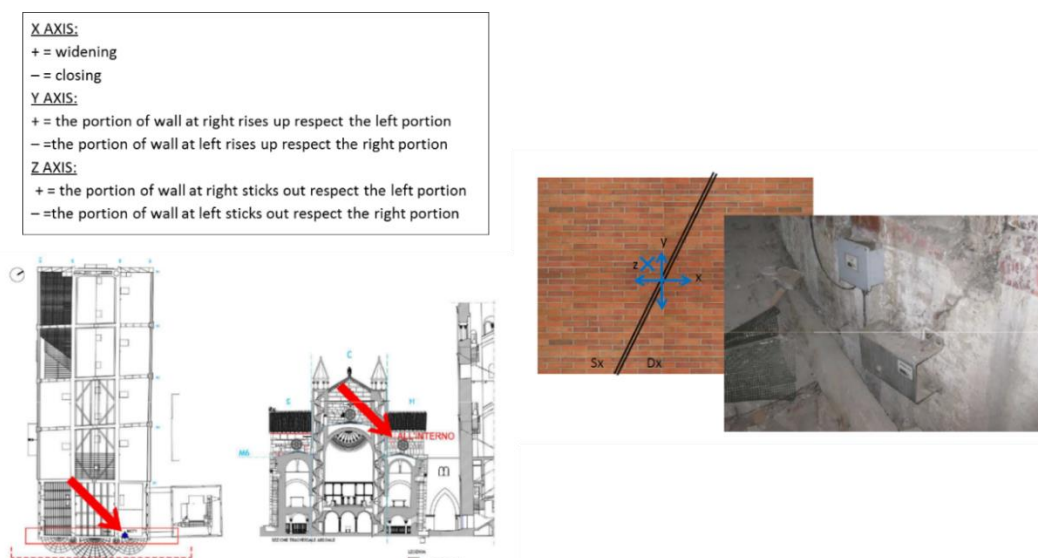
Triaxial joint meter installed in the longitudinal wall of the Cathedral (MGT1)
